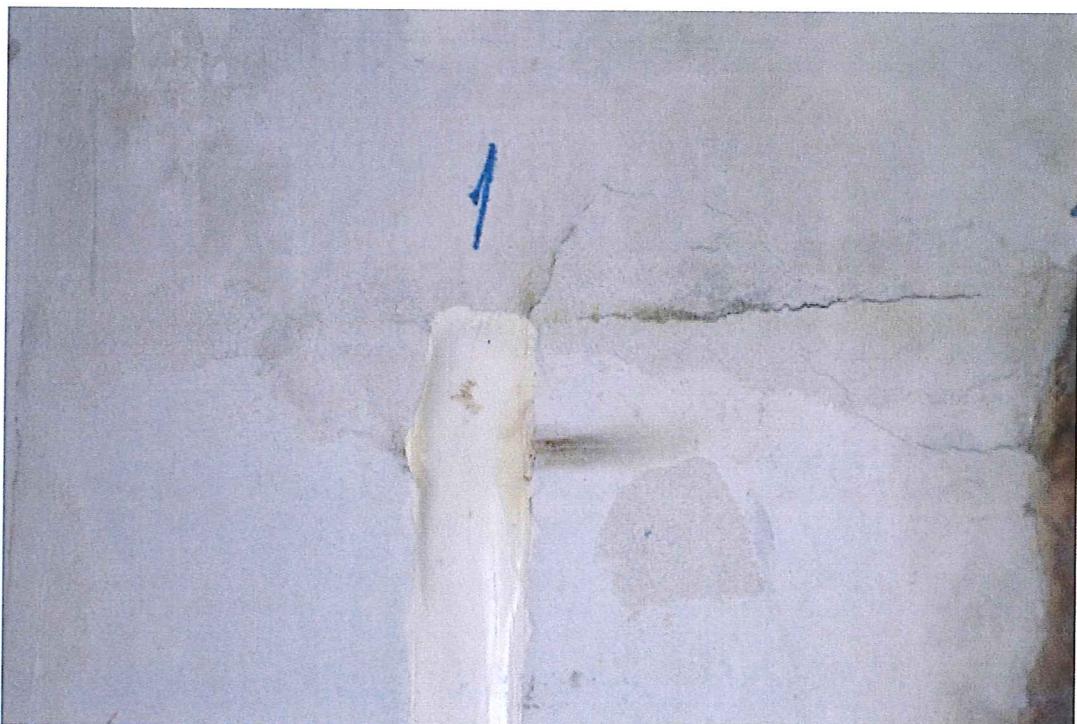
Integrity failure at the top of joint seal 1 after 153 minutes of testing
